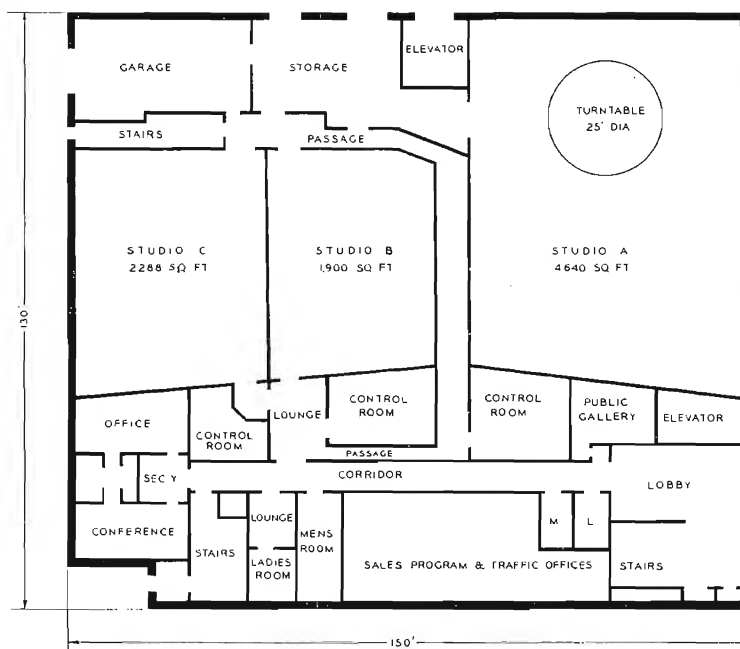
First floor plan of WWJ studio building showing the station's three television studios.
